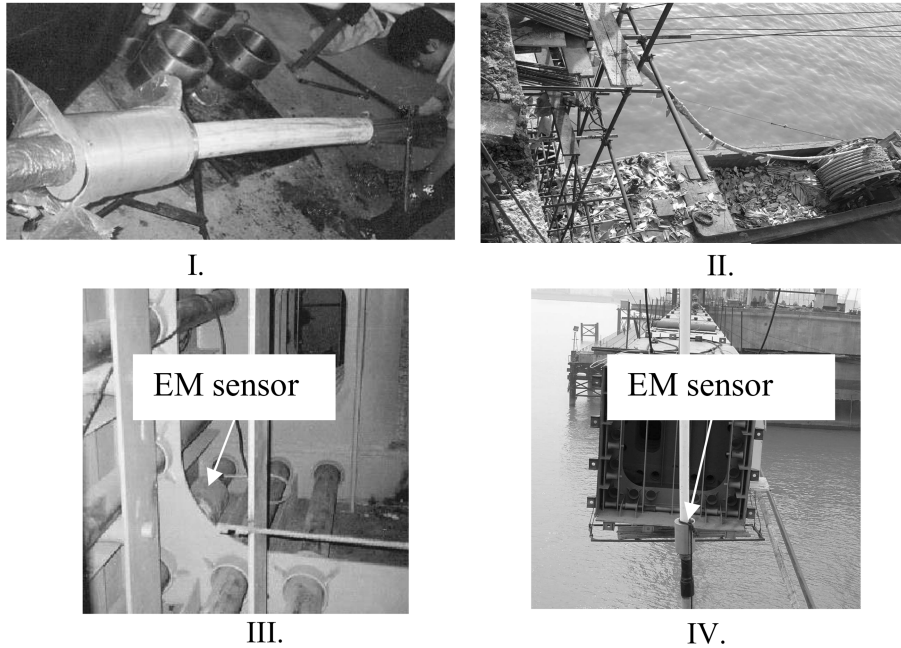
Pictures of EM sensors and cables, I-Sensor mounted on hanger cable, II. Post-tensioned cable being installed into the box girder, III. post-tensioned cable with EM sensor in box girder, IV-Hanger cable with EM sensor
